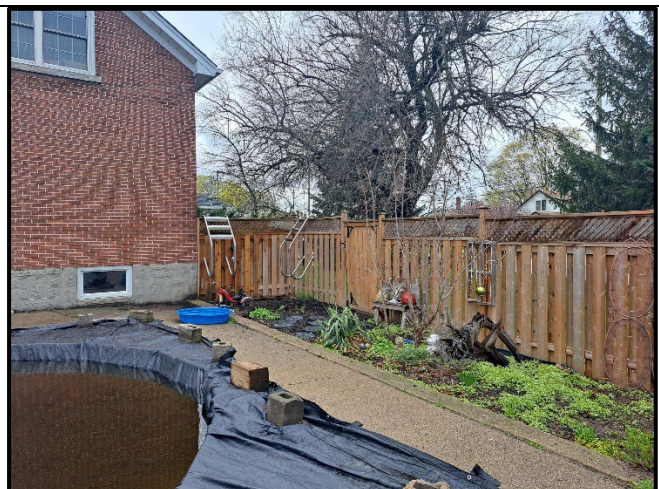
Inside view of the fence in relation to the existing concrete deck and swimming pool
